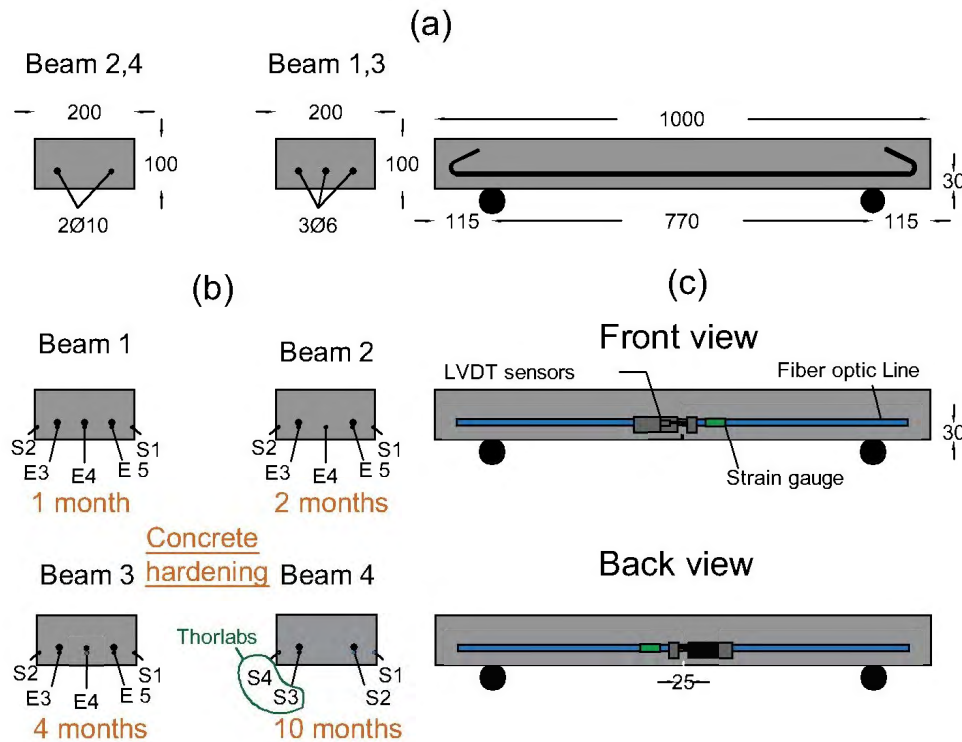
(a) Dimensions and reinforcements of the beams; (b) Fiber optics instrumentation policy Beam 1, (c) Beam 2, (d) Beam 3, (e) Beam 4.
